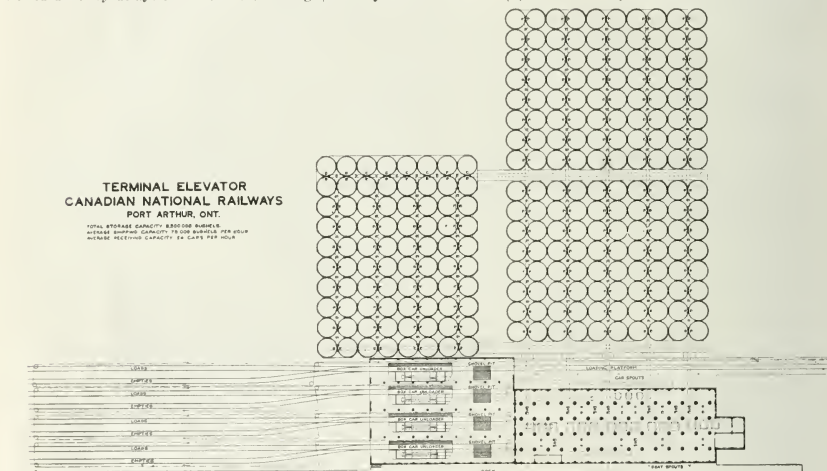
Plan of Canadian National Rys. elevator at Port Arthur, Ont., showing layout of box car grain unloaders and haulage system.
